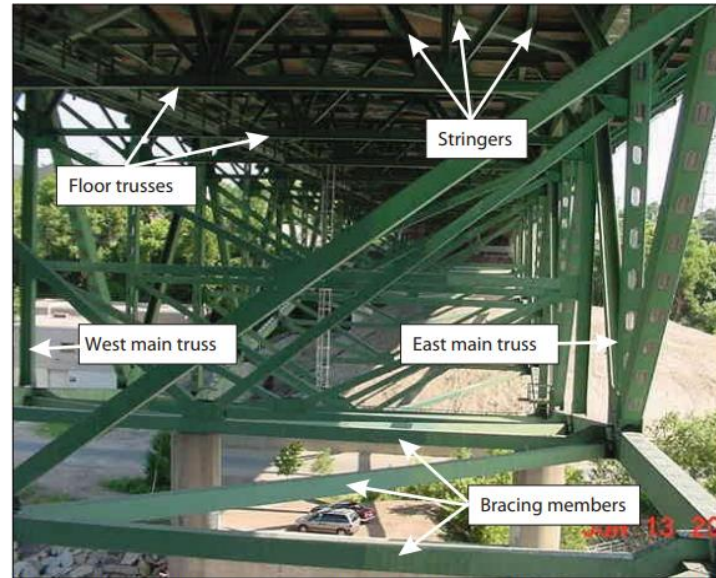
Interior structure of north portion of deck truss, looking north. (Source: URS Corporation)
